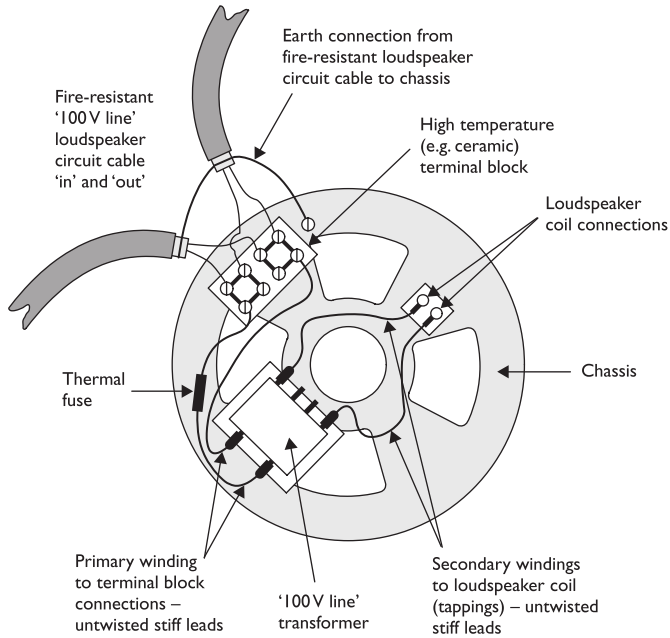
Rear view of chassis of cone-type VA loudspeaker
